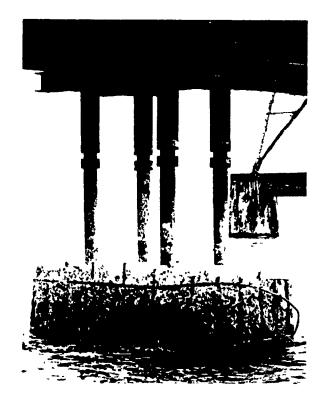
BRIDGE SPAN ON TEMPORARY BEAMS SUPPORTED BY STEEL COLUMNS
